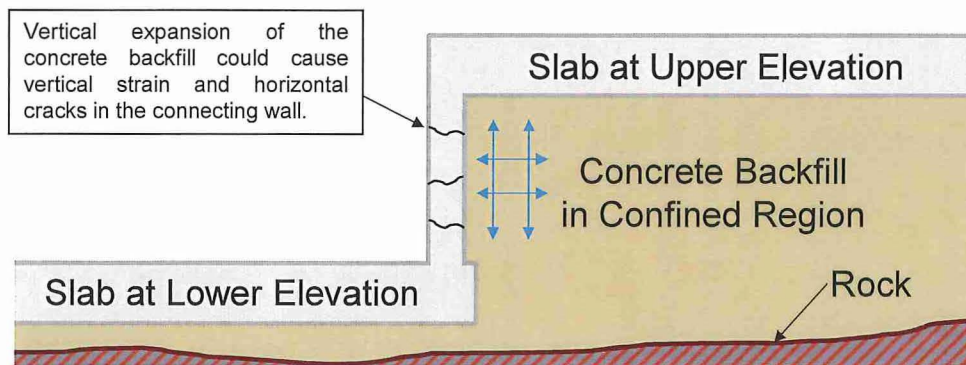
Structural Cracks due to Concrete Backfill Expansion.
